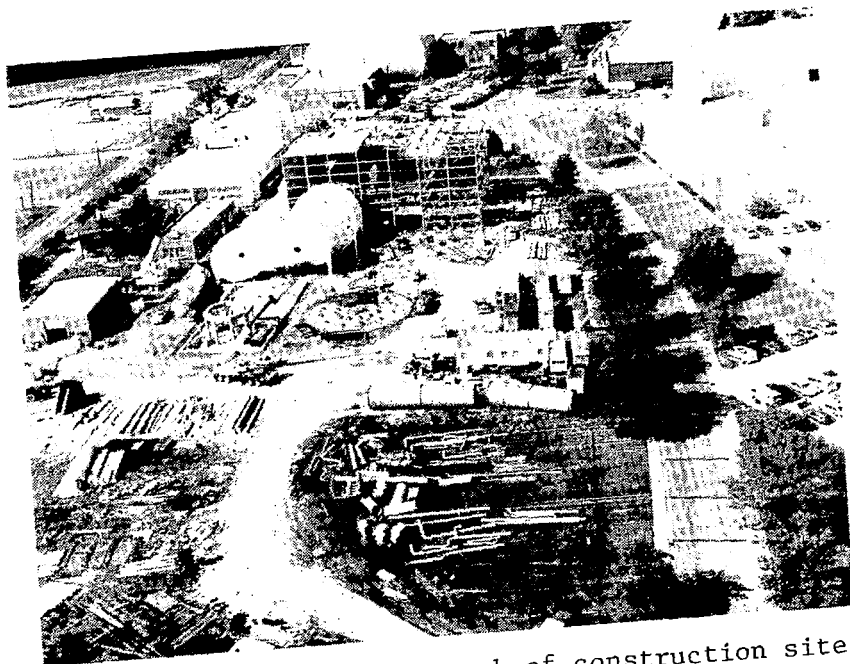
Aerial photograph of construction site as it was November 1, 1980.
